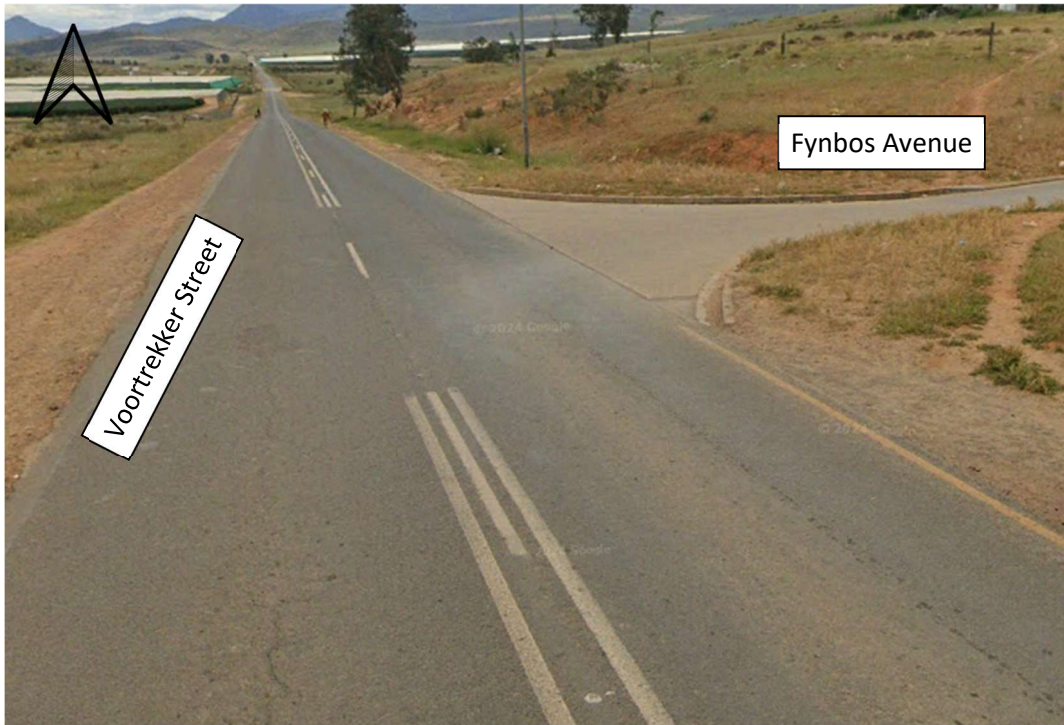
Lane Layout at Voortrekker Street/Fynbos Avenue Intersection
